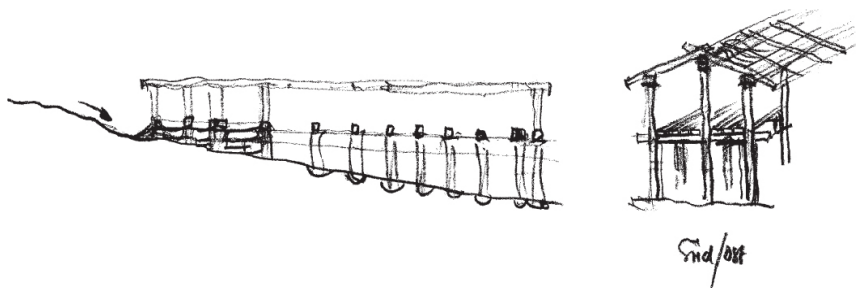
Sketch of possible reconstruction of a house built on a slope. Drawing by R. Mauss.
